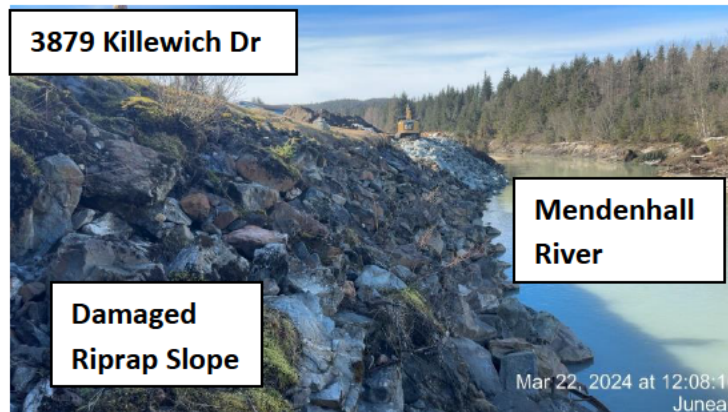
Looking from the adjacent property at 3883 Killewich Dr towards 3879 Killewich Dr.
